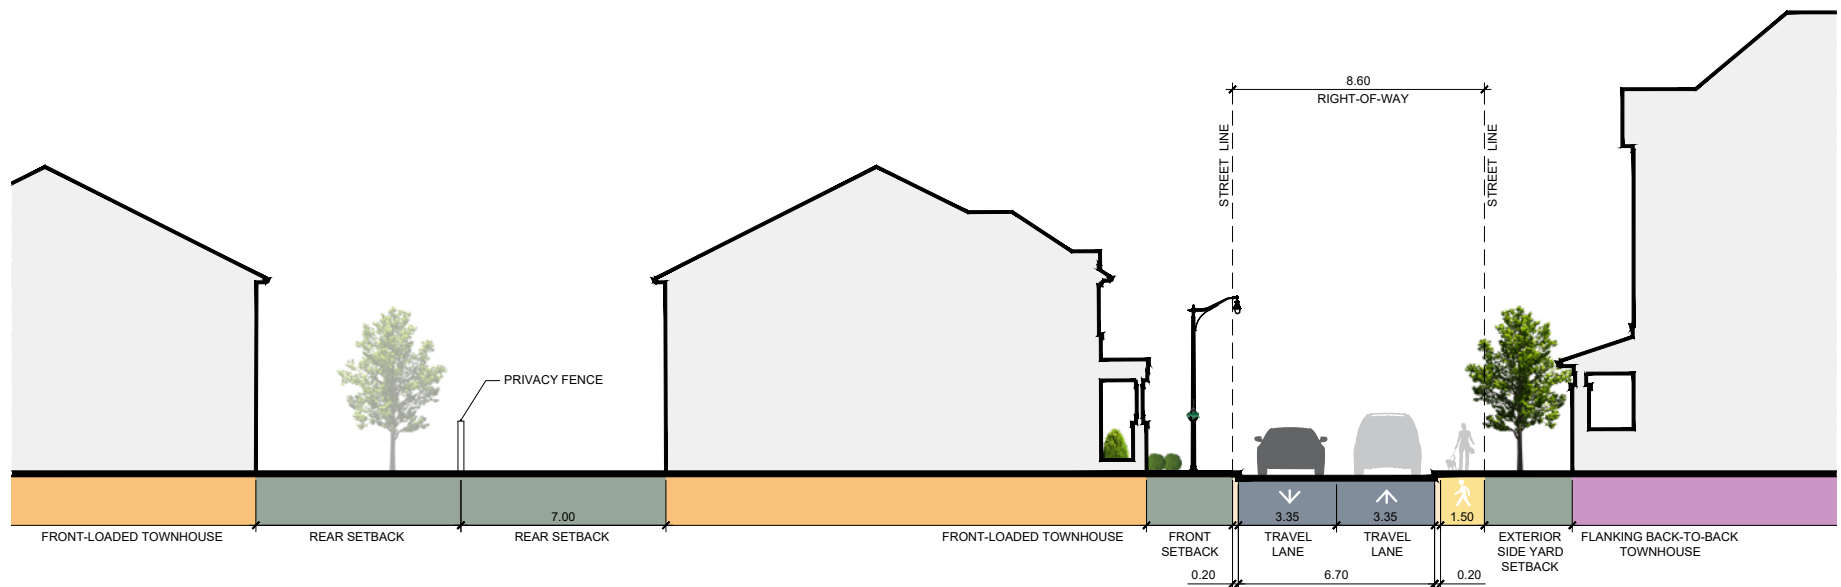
C-C' 8.60m Laneway ROW Cross Section
